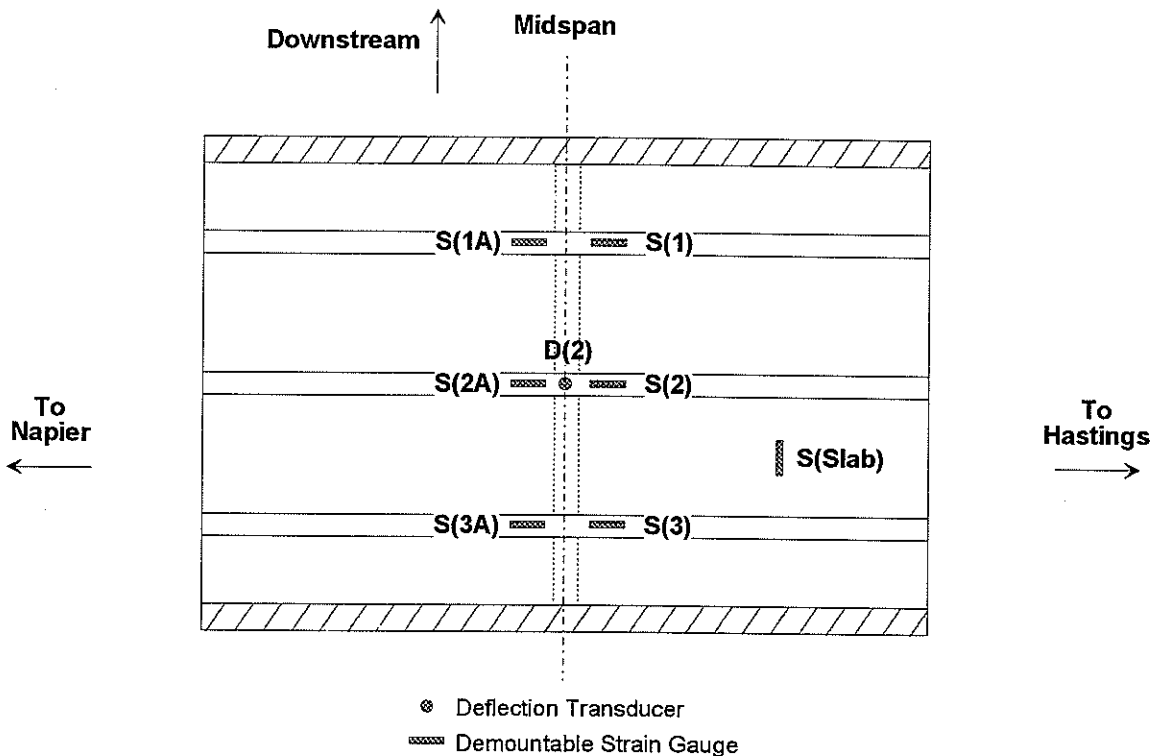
Instrumentation plan for Waitangi Washout Bridge (5<sup>th</sup> span from southern end).
